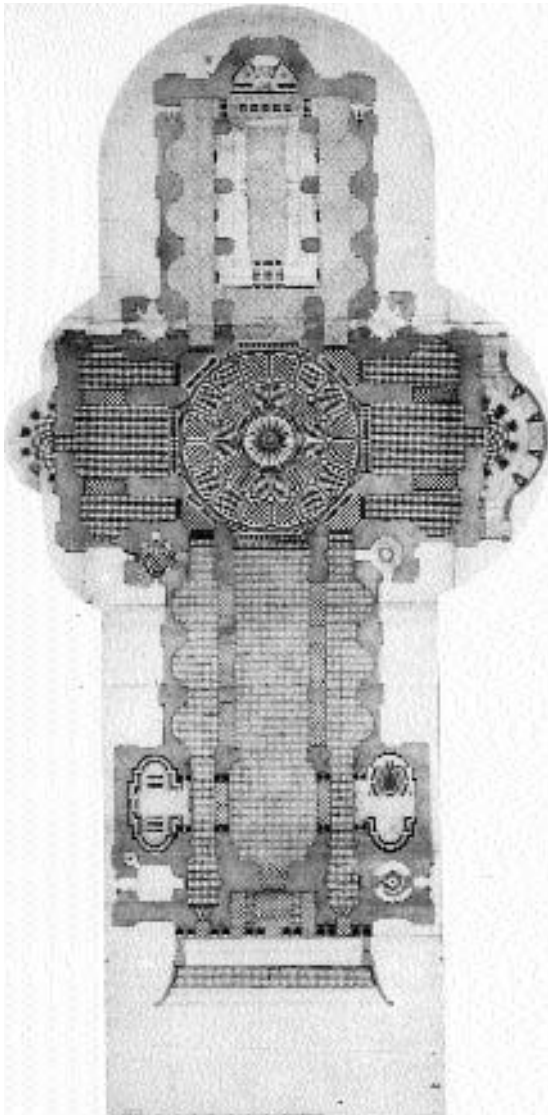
St Paul's Cathedral, London 1675–1711 by Sir Christopher Wren. Paving plan, 1708 completed 1710. Drawing by Dickinson. From *The St Paul's Cathedral Collection of Wren Drawings*, on deposit with the Guildhall Library, Corporation of London (Photograph, Jeremy Butler; copyright, Guildhall Library.)
